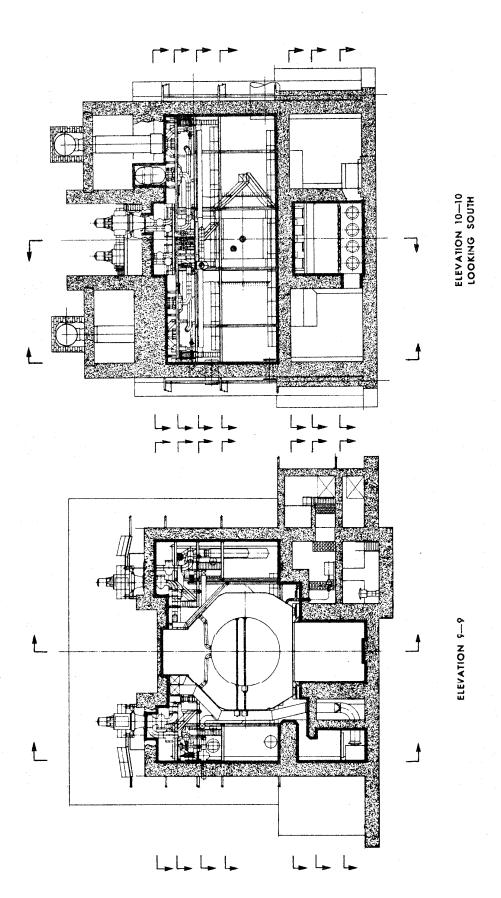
Bruce G.S. Reactor Building, Plans and Elevations
